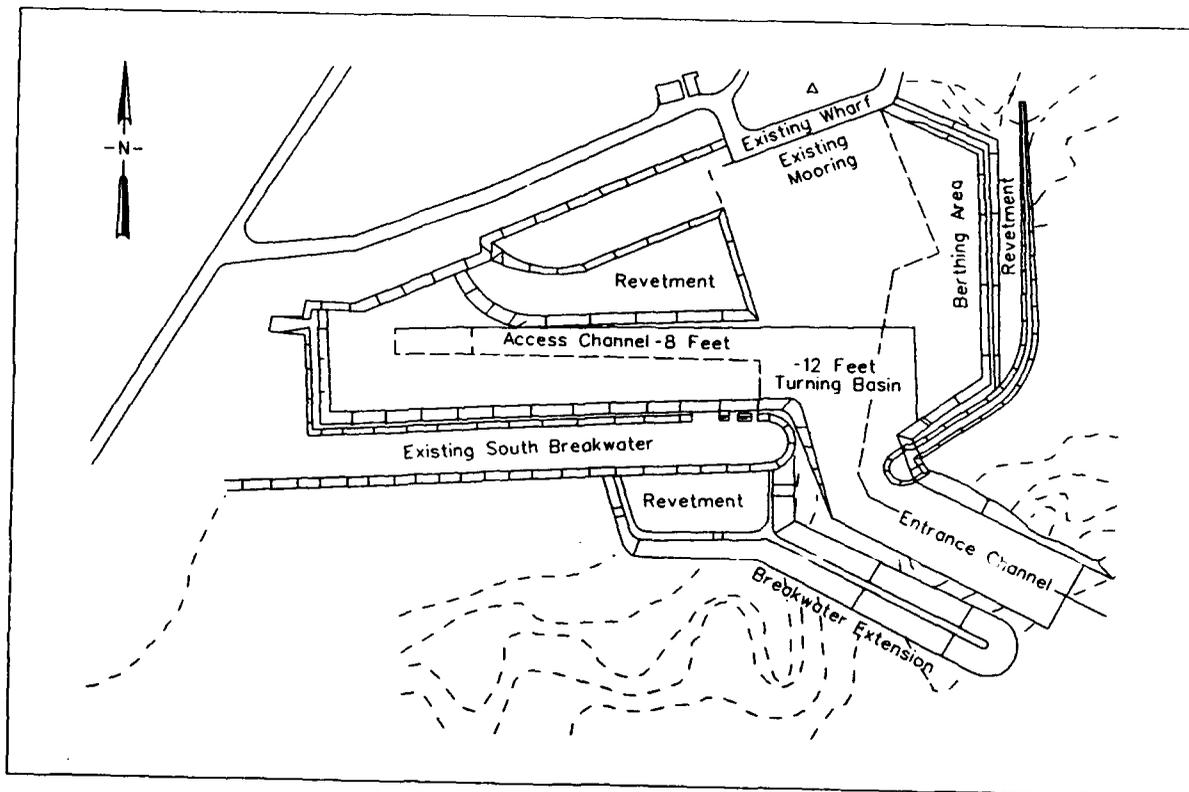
Alternate Design Plan I, Maalaea, Maui, Hawaii
